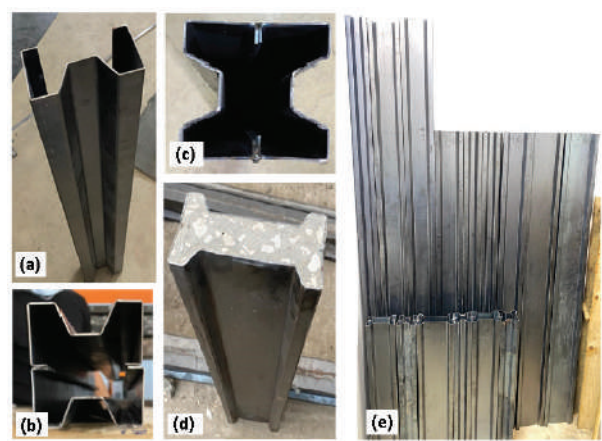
Specimens manufacturing process (a) Forming sigma sections, (b) assembling column section, (c) welding the two stigmas, (d) casting concrete and (e) all fabricated steel shells.
